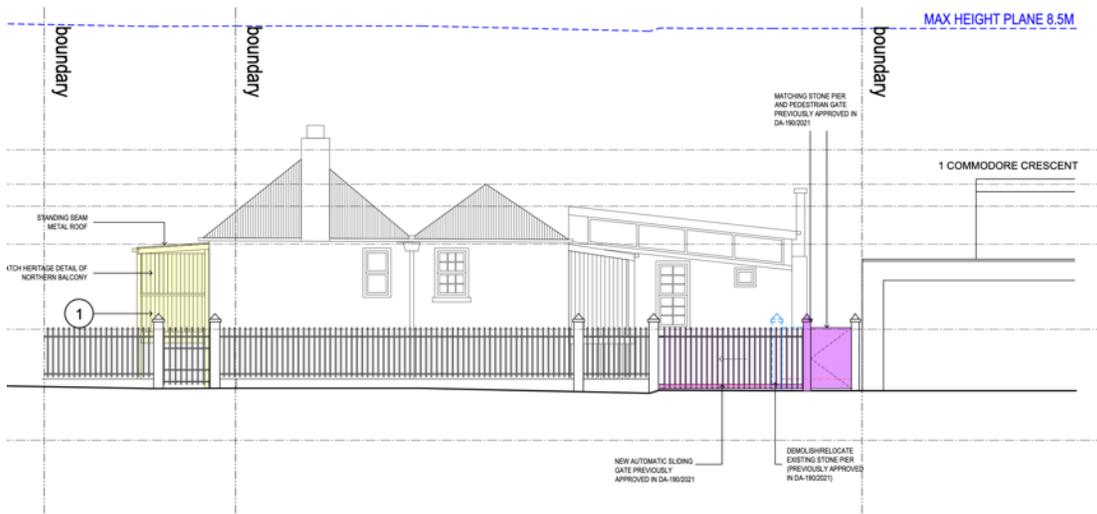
, Commodore Crescent Elevation, *Michael Cumming Architect*, 24.02.23
